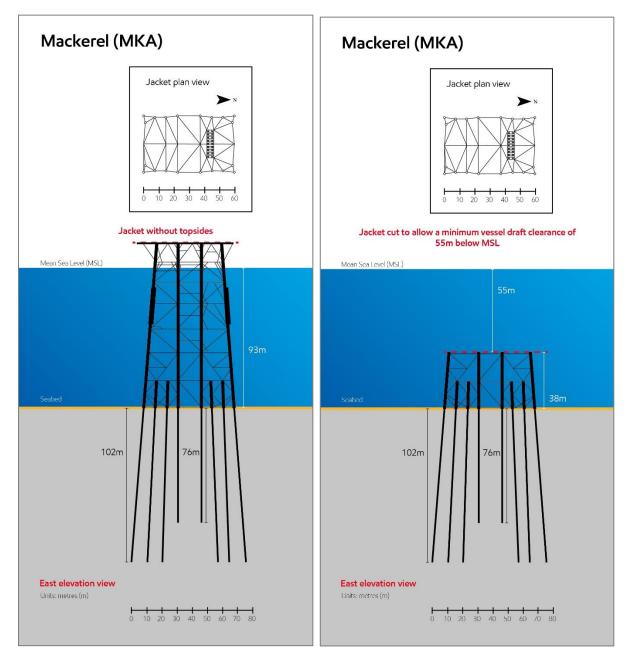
Mackerel Steel Piled Jacket without topsides (left) and under proposed end state (right)
